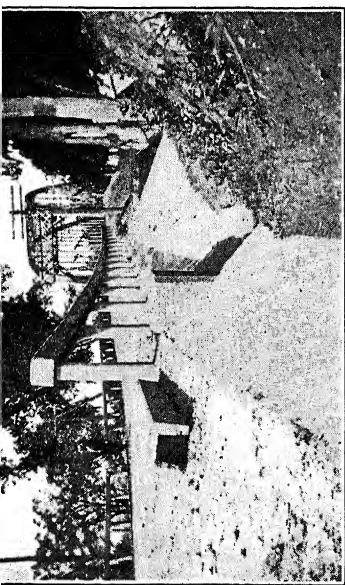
A.—In times of high water this road is covered to a depth of 5 to 7 ft. Note the low water culvert, concrete shoulders to prevent scour, and concrete guard rail protection.
